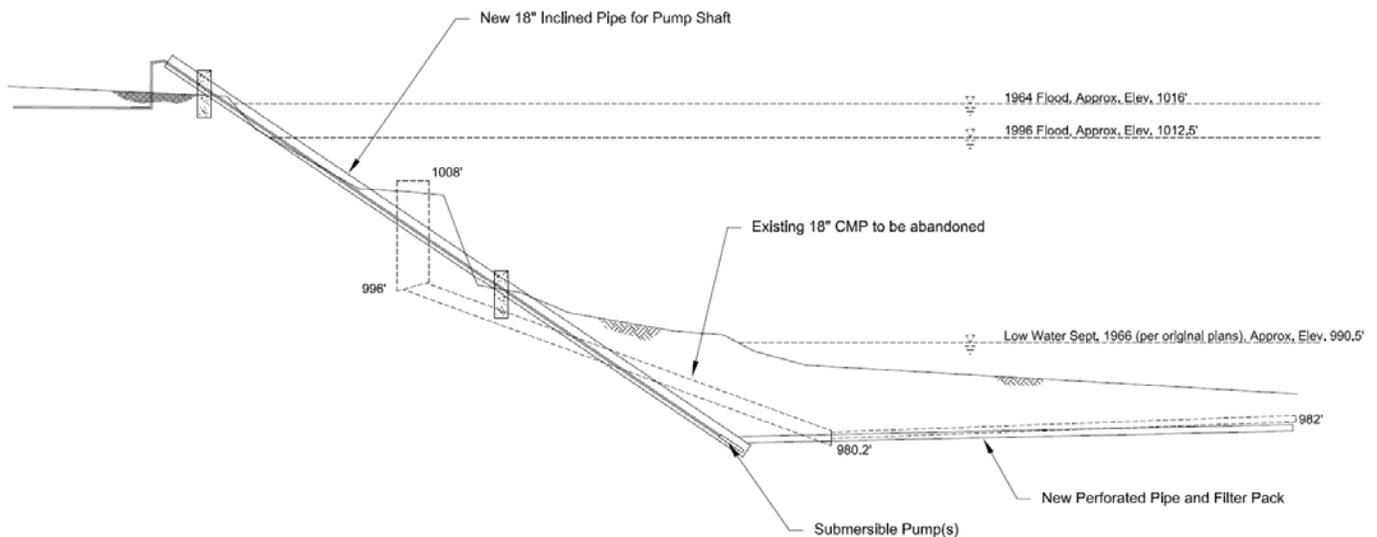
Reconstructed Infiltration Gallery Intake
